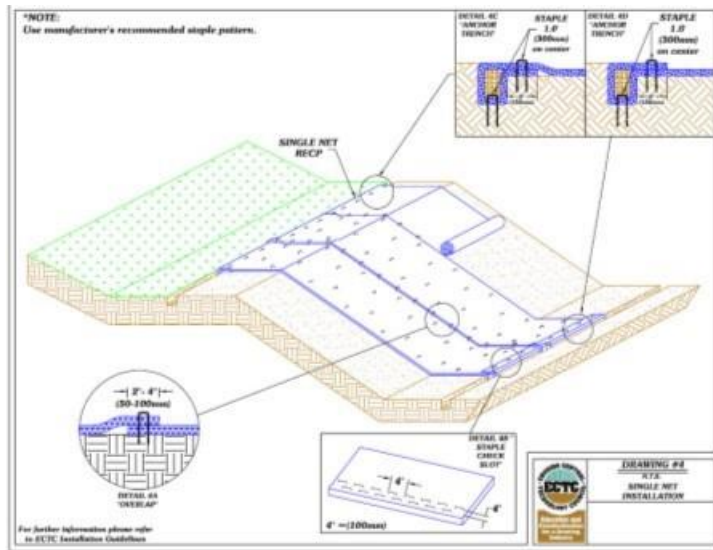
Downslope RECP Anchoring (ECTC 2014).
